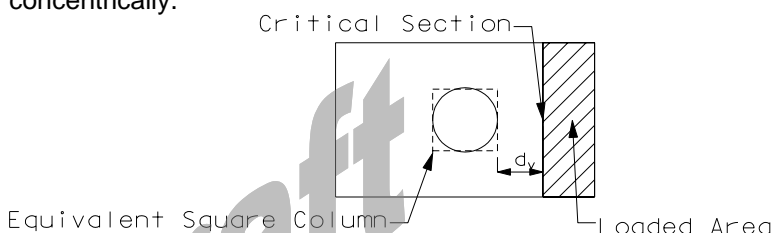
Critical Section For One Way Shear Design
